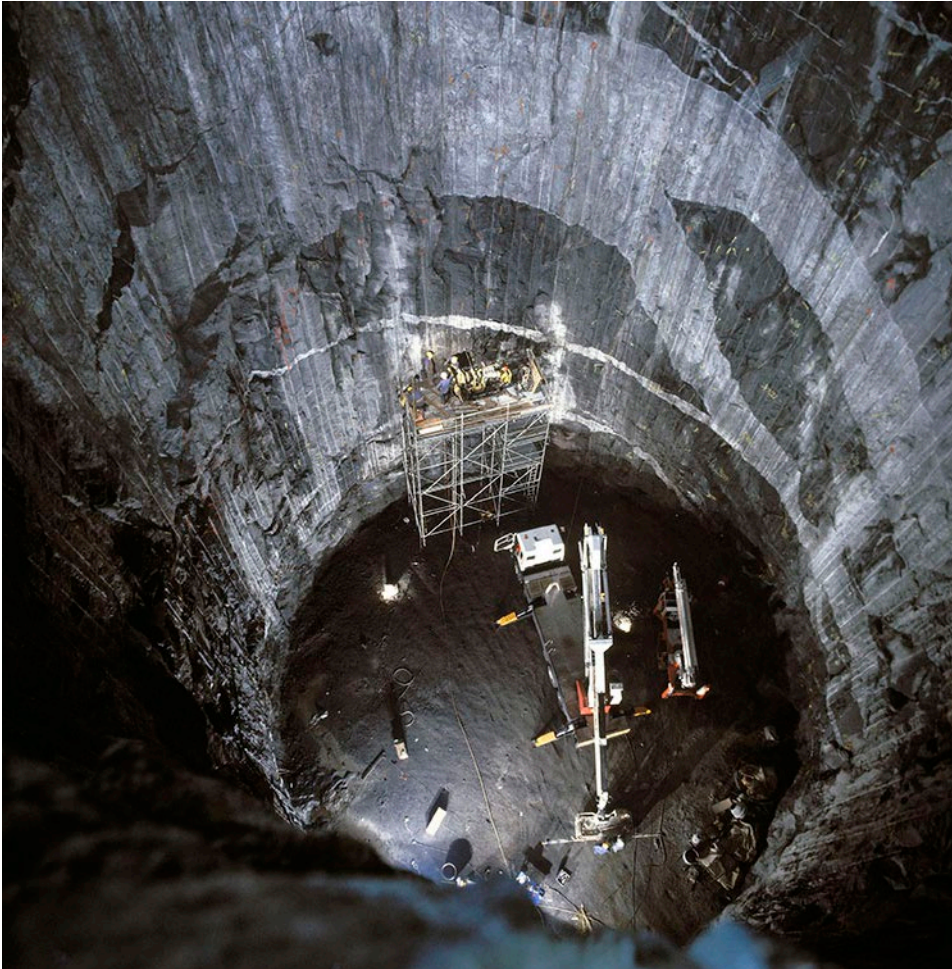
Operating and decommissioning waste from Olkiluoto nuclear power plant will be disposed of in the VLJ cave on the plant site. Source: TVO/Korpi-Hallila.
